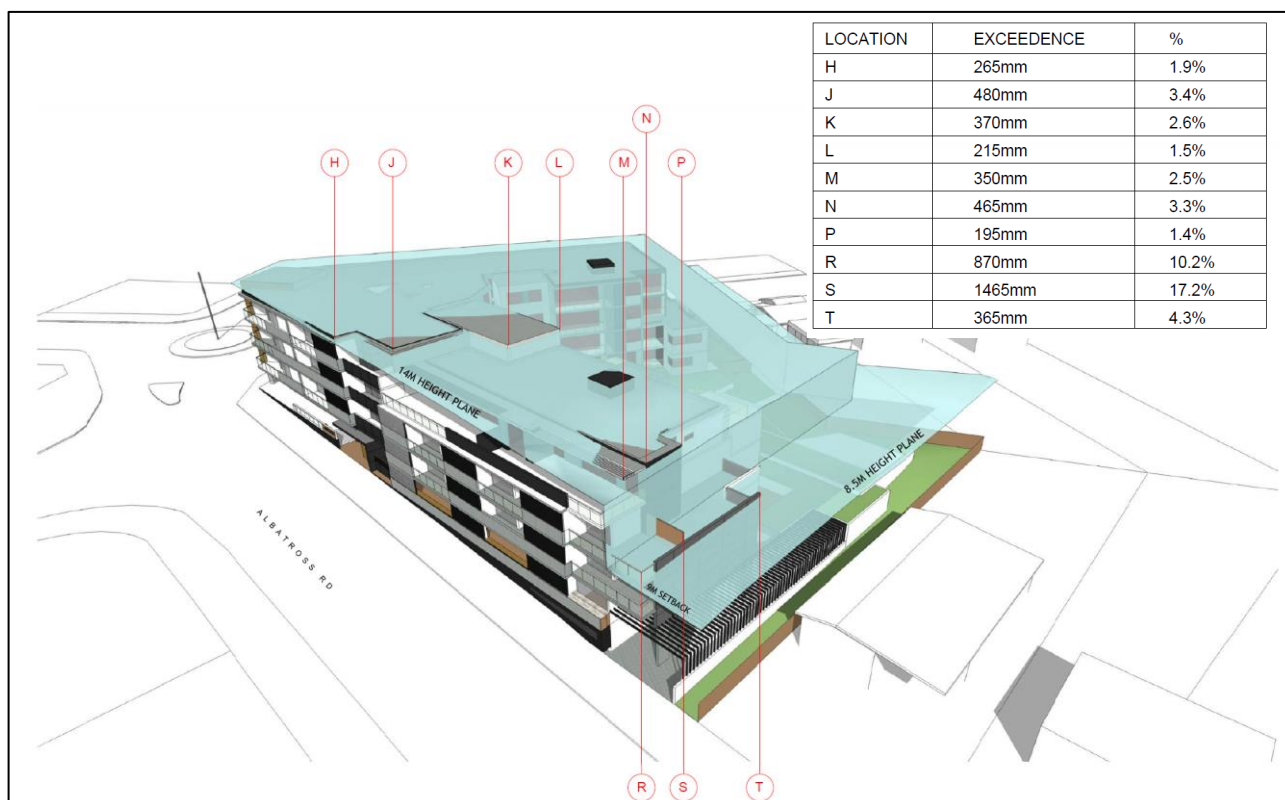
Height Plane instructions relating to the 14.0m (N2) and 8.5m (I2) maximum building height - southwestern view from Albatross Street.
